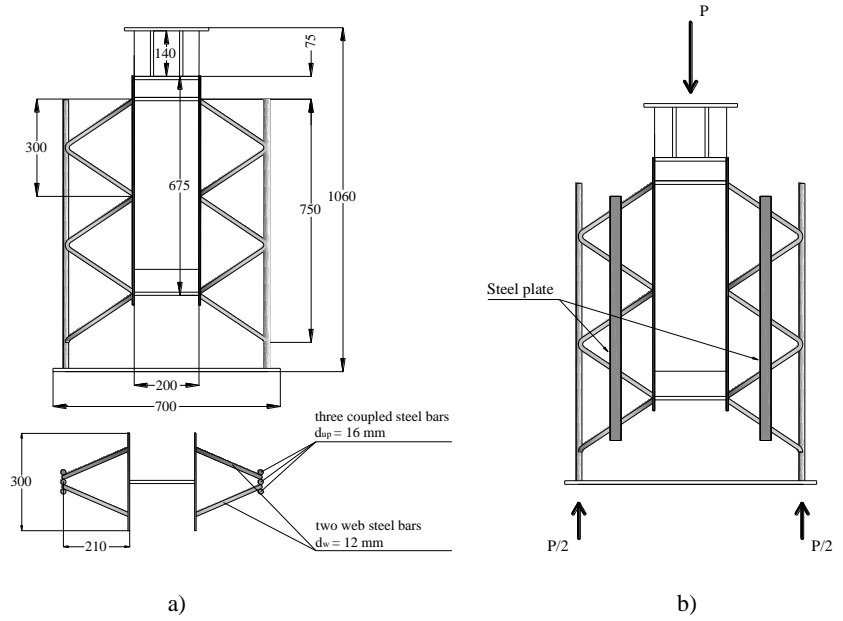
Push-out test in phase I (dimensions in mm): a) specimen S1; b) specimen S2.
